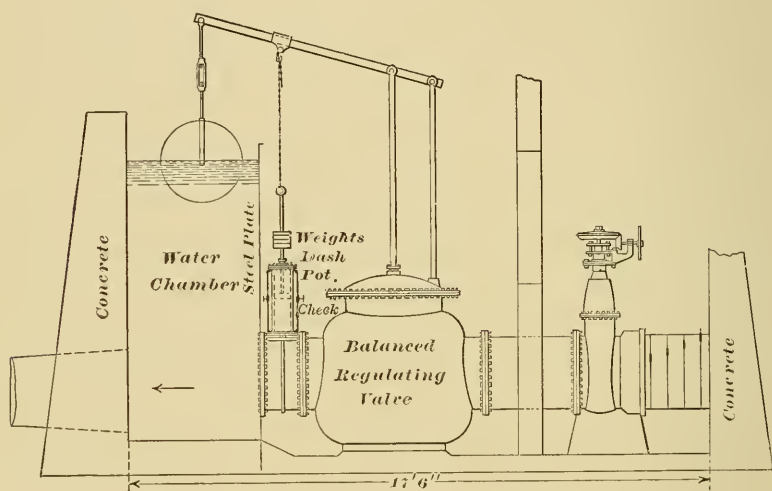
BUTTE WATER WORKS. SECTION OF REGULATING CHAMBER.
